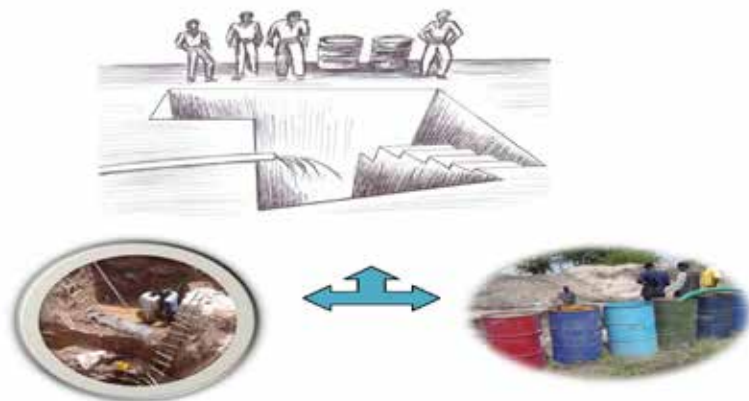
Fixing Drilling Pipe with Simple Sludge
